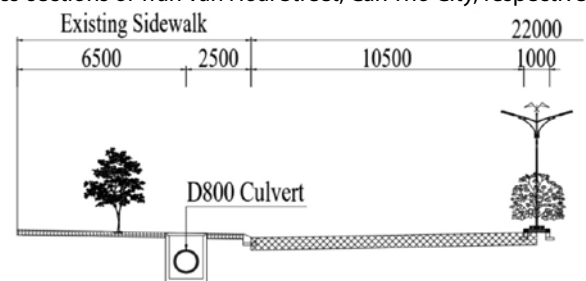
Half of the cross-section of the existing pavement (unit: mm)
